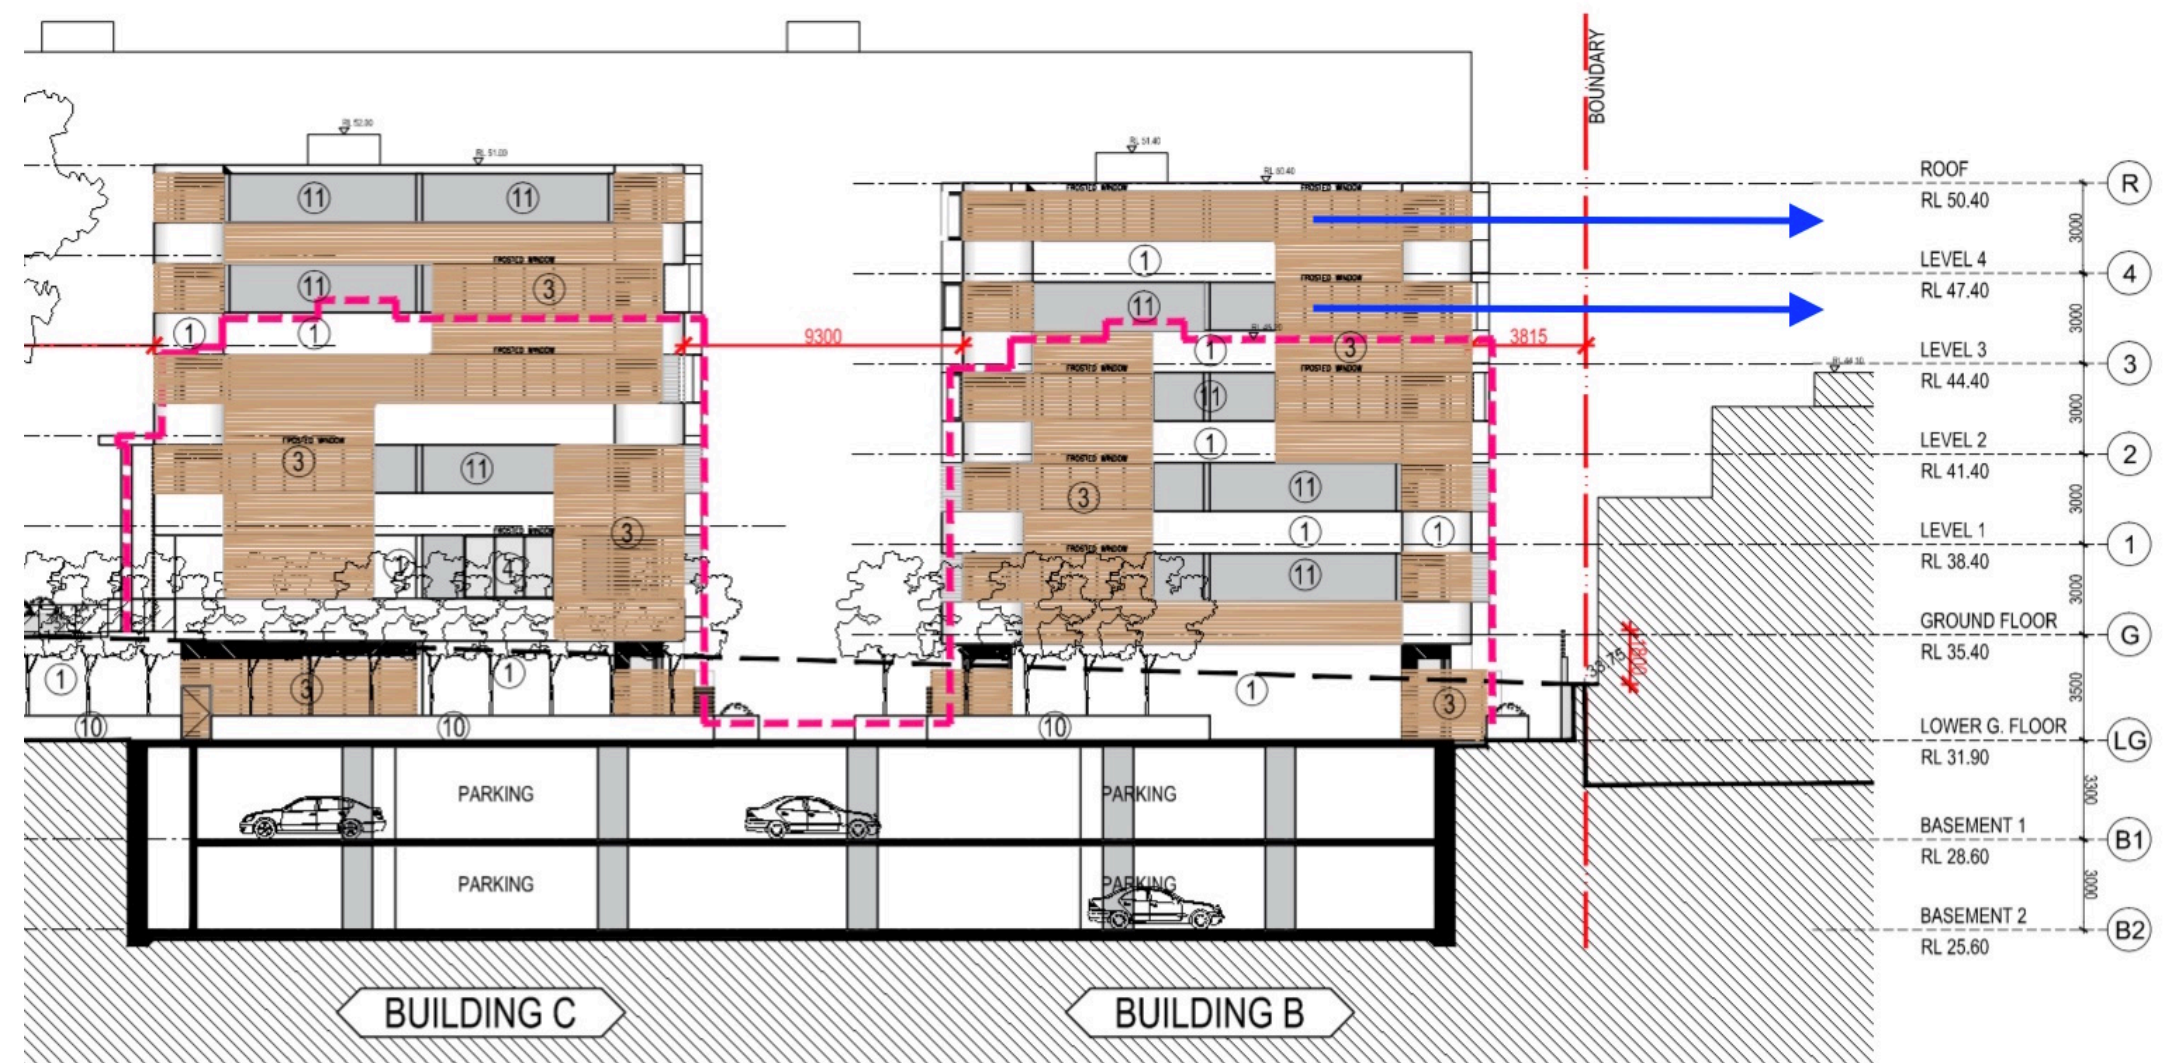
North elevation of Buildings B & C, illustrating the building separation and interface with the recently completed development at No. 153 George Street.
